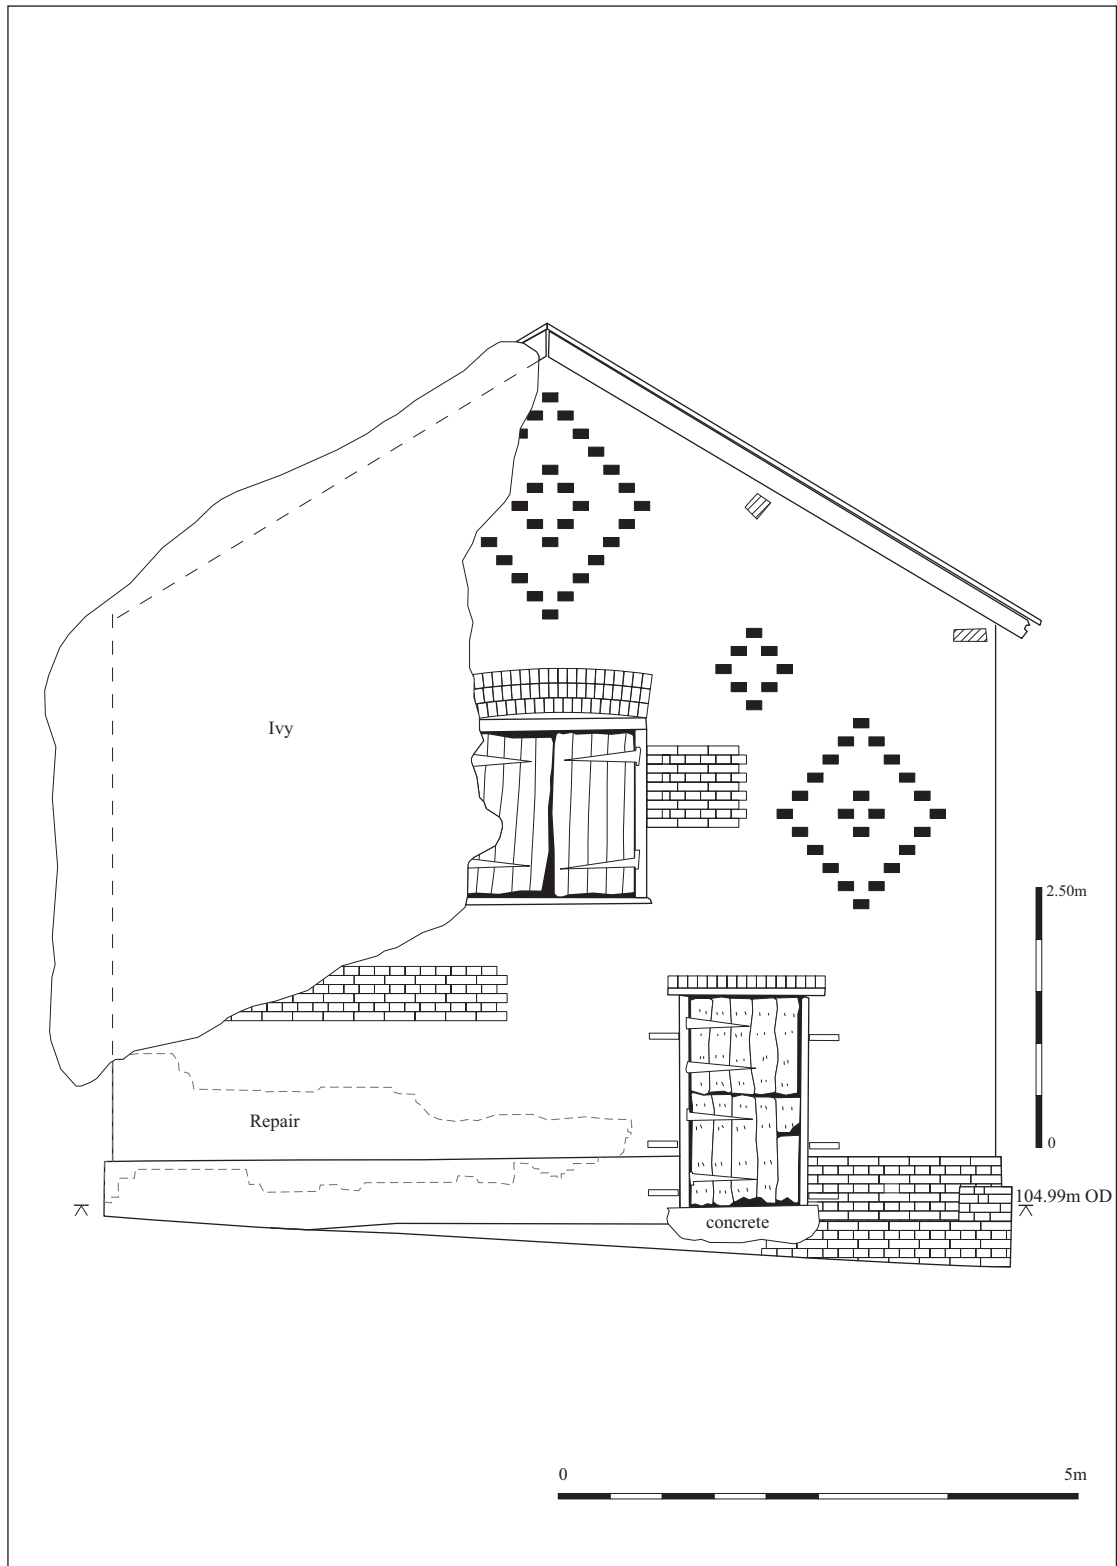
South-facing elevation of Building 1 (Threshing Barn)
